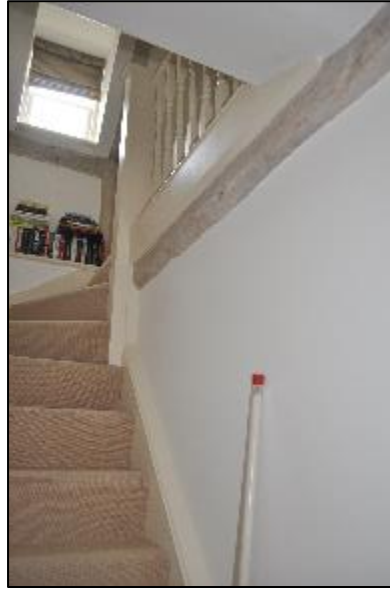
The staircase of S1 with an exposed wooden beam running north-south. Above the narrow window in the northern wall.
